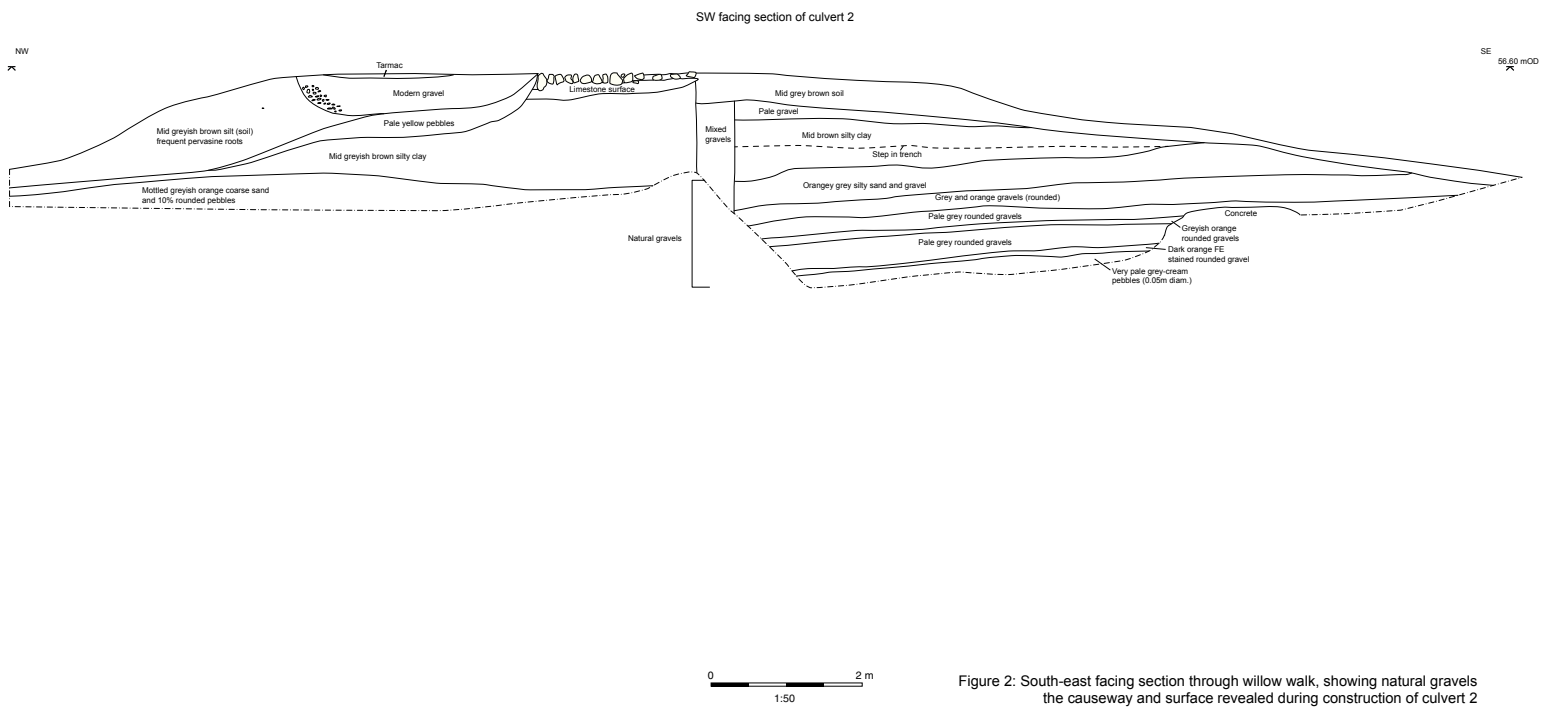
South-east facing section through willow walk, showing natural gravels the causeway and surface revealed during construction of culvert 2
